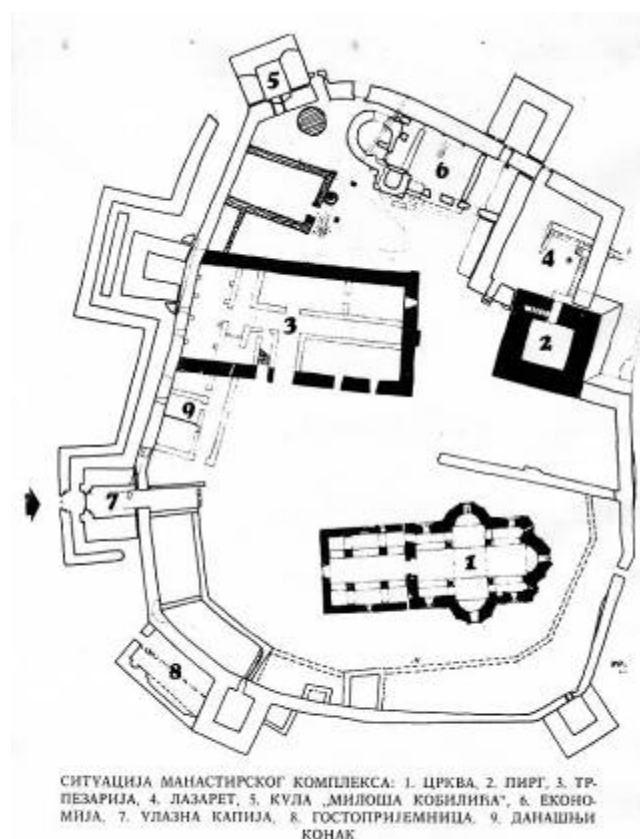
Ground floor of the site after the archaeological excavations (1970-2007)
